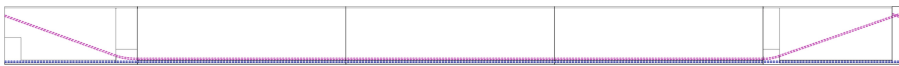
Longitudinal section of a precast girder with installations and ducts (tendon type 1 in blue and type 2 in purple color)
